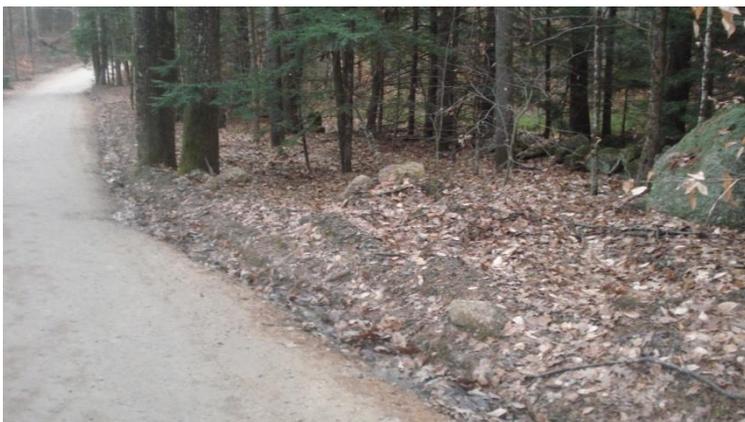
Kaulback Road, Looking South, Proposed Turn-Out Location (BMP 24)
